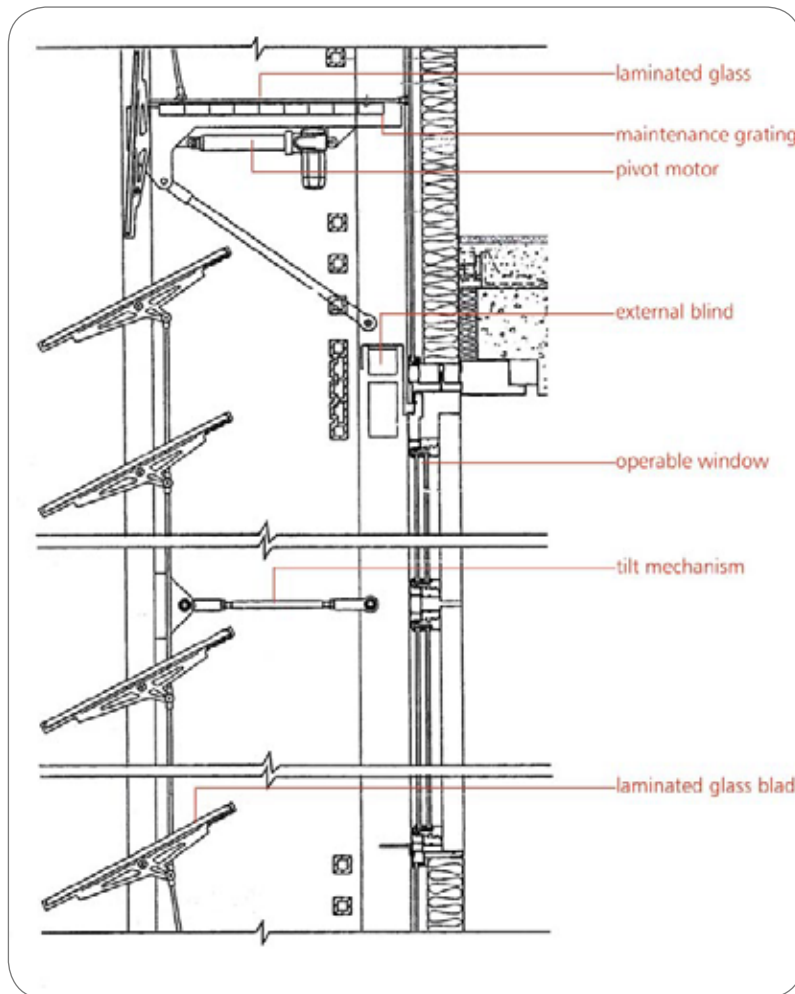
section through curtain wall, debis tower, potzdamer platz_renzo piano
